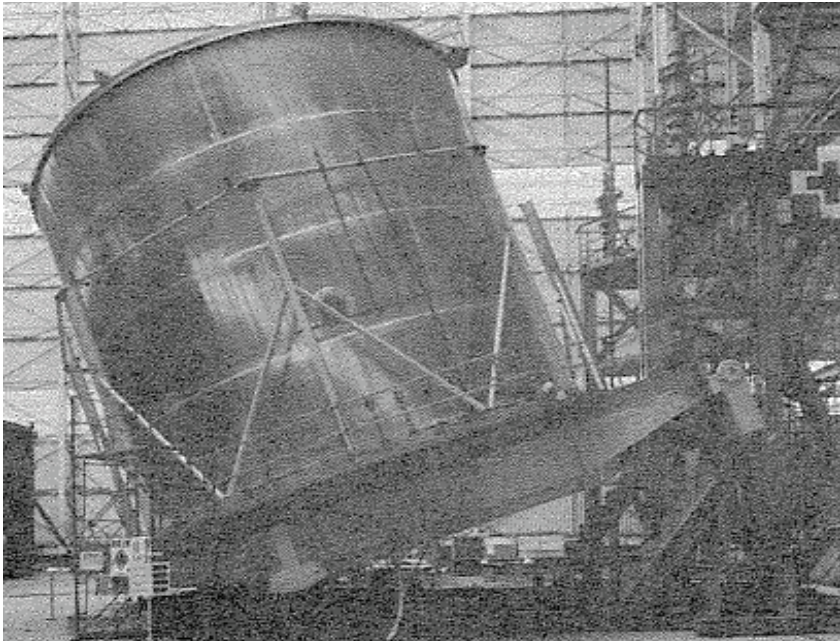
VIEW OF STATIC TILT TEST USING LARGE-SCALE TANK MODEL
